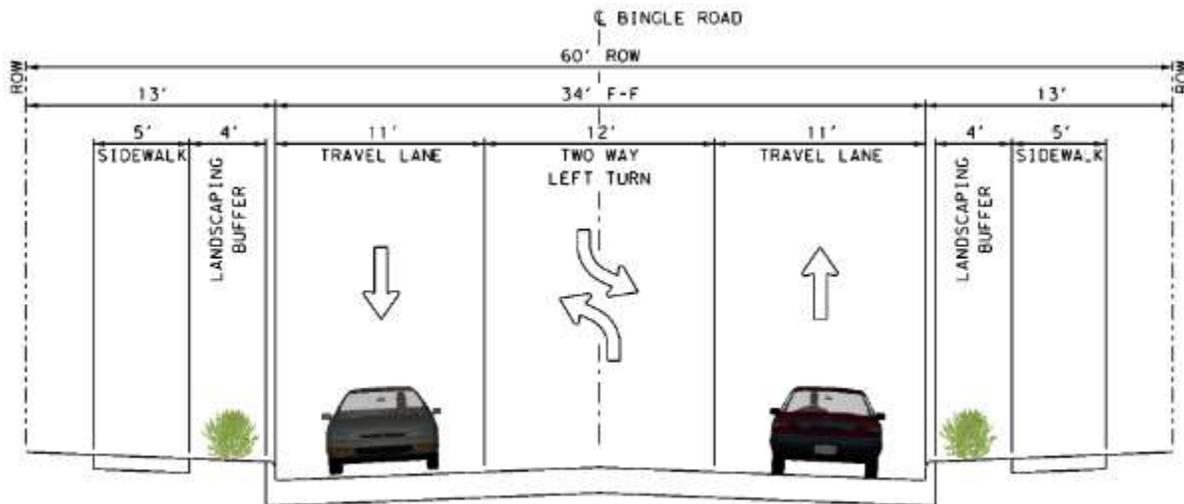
(Option 3) Proposed 3-Lane Section (Reduce Existing Pavement Width, Add Landscaping)
